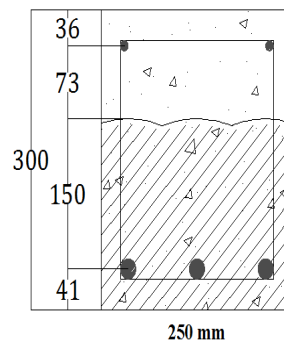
Proposed effective reinforced concrete section in the tension zone
